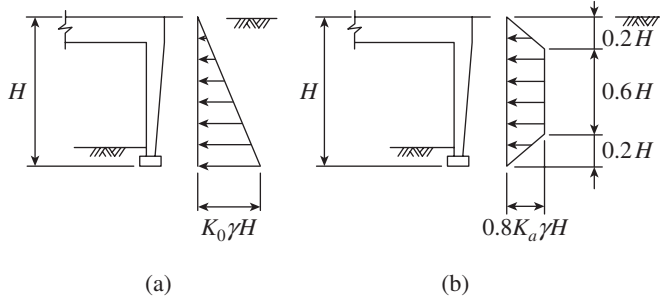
Lateral earth pressure distribution for bridge abutment (a) Case 1 (b) Case 2
